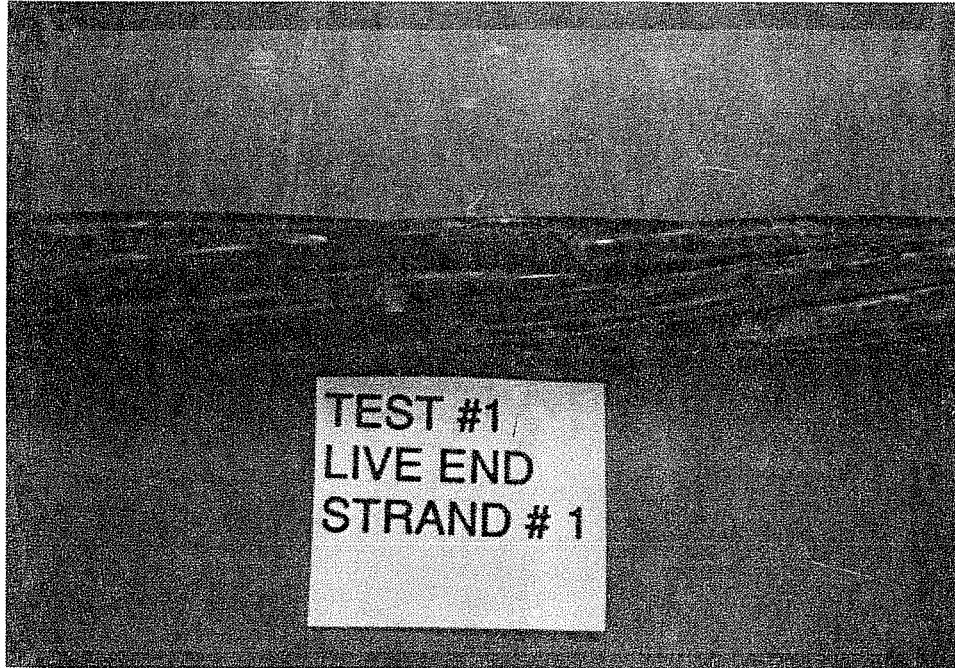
Photograph of a Test #1 wire fracture with a normal fatigue fracture surface.
